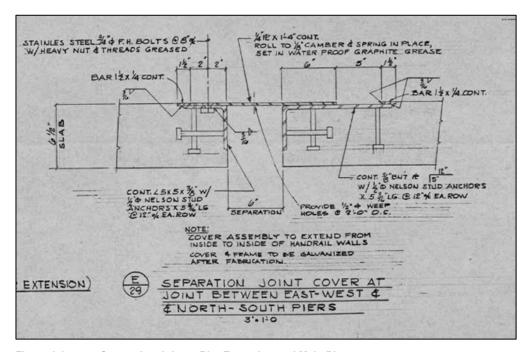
Separation Joint at Pier Extension and Main Pier
